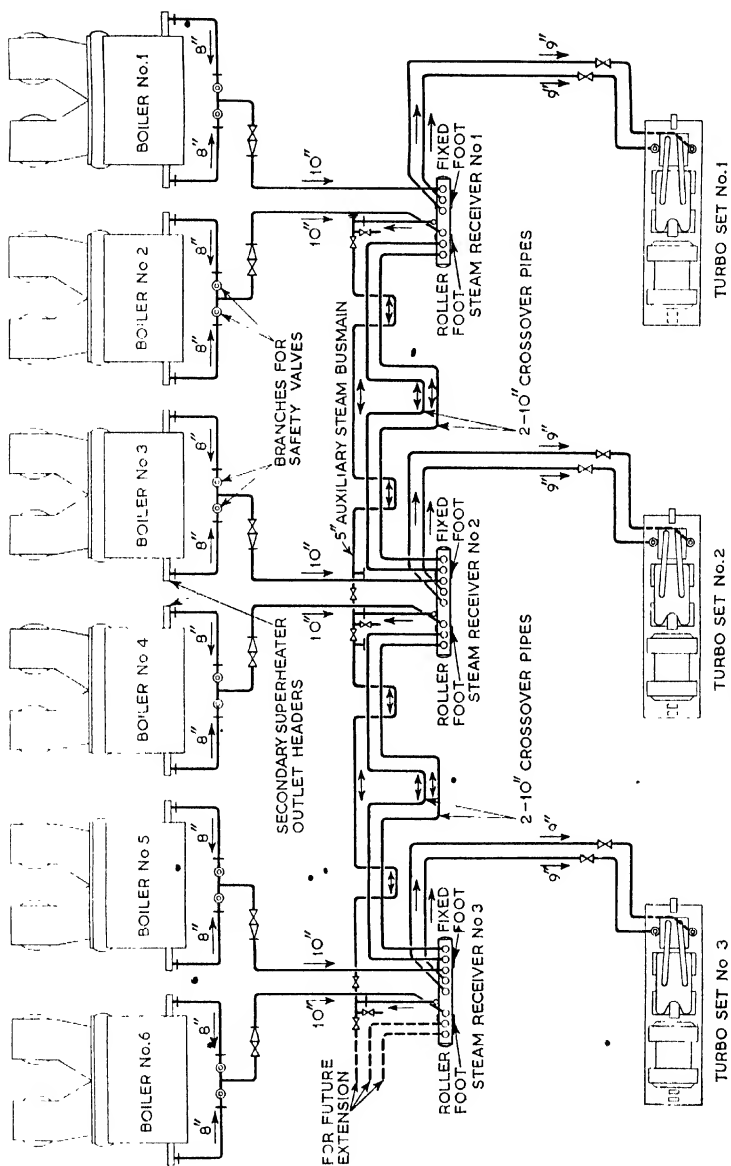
STEAM-PIPE DIAGRAM FOR A TYPICAL POWER-PLANT INSTALLATION
